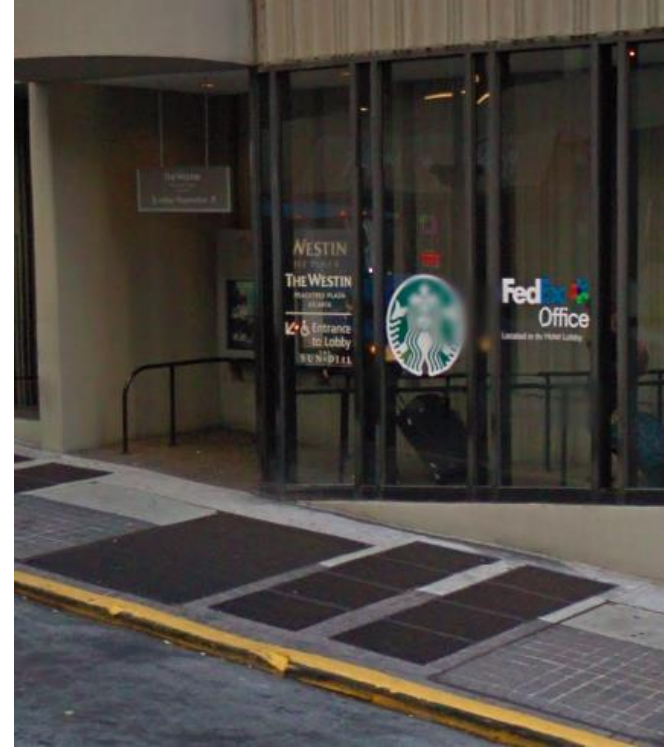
Westin Peachtree Plaza wheelchair ramp (viewed from Andrew Young International Boulevard). Problematic grating throughout the sidewalk.
